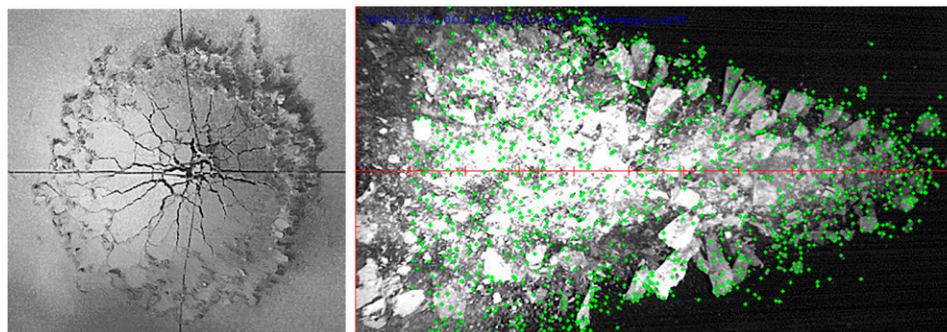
Spalling of the concrete at 1.4 ms (left) and tracking at 15.1 ms (right)—SN142.
